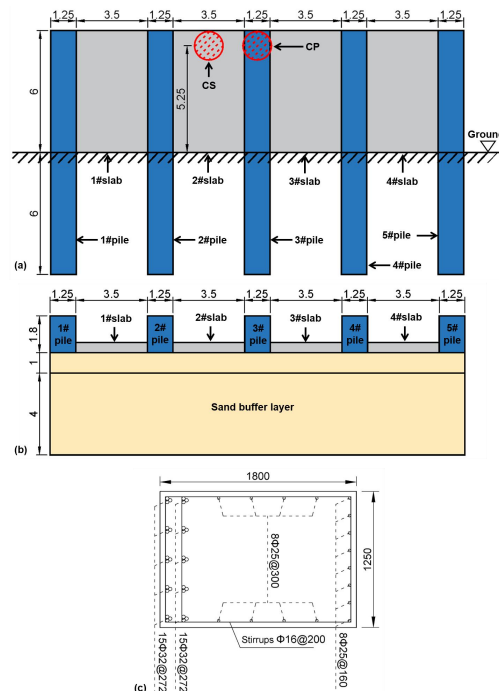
The design diagram of PSRW (a) front view (unit: m) (b) top view (unit: m) (c) cross-section profile of pile (unit: mm).
